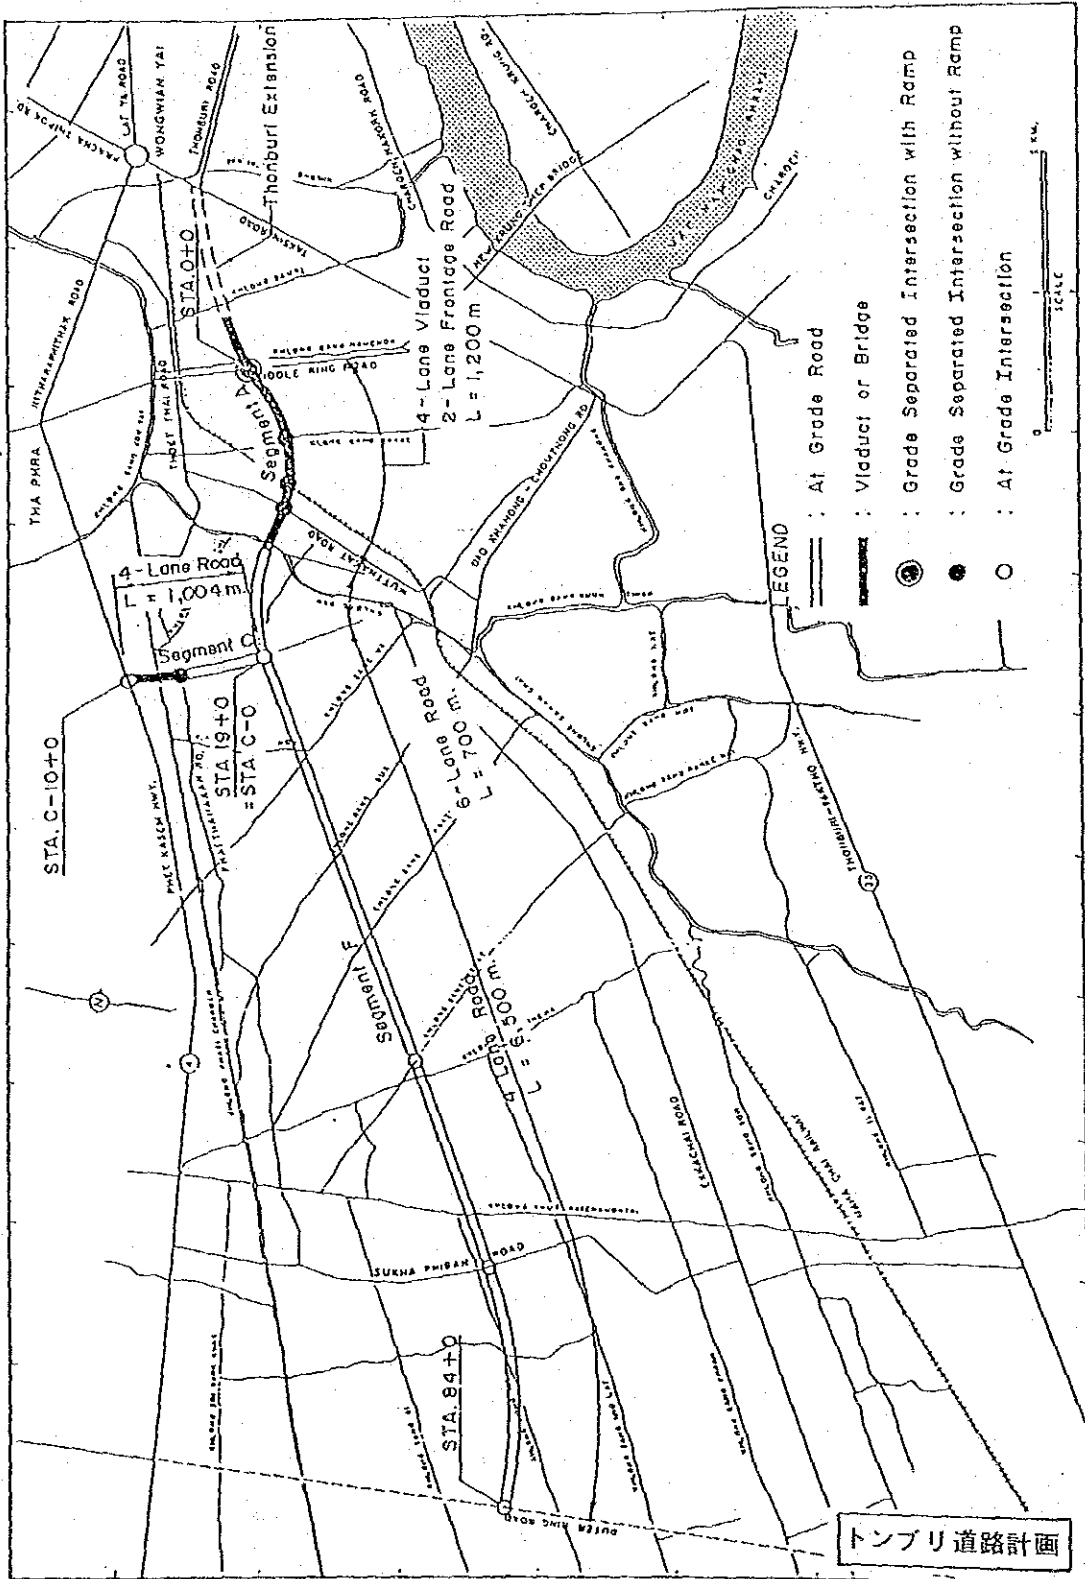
Layout of Thonburi Road Extension Route
